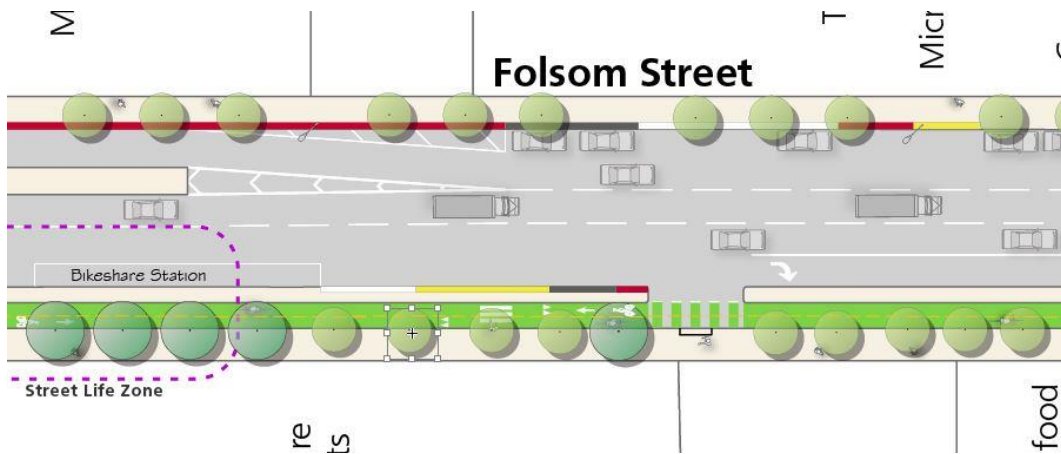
Typical Plan View of Folsom Street between 3rd Street and 2nd Street
